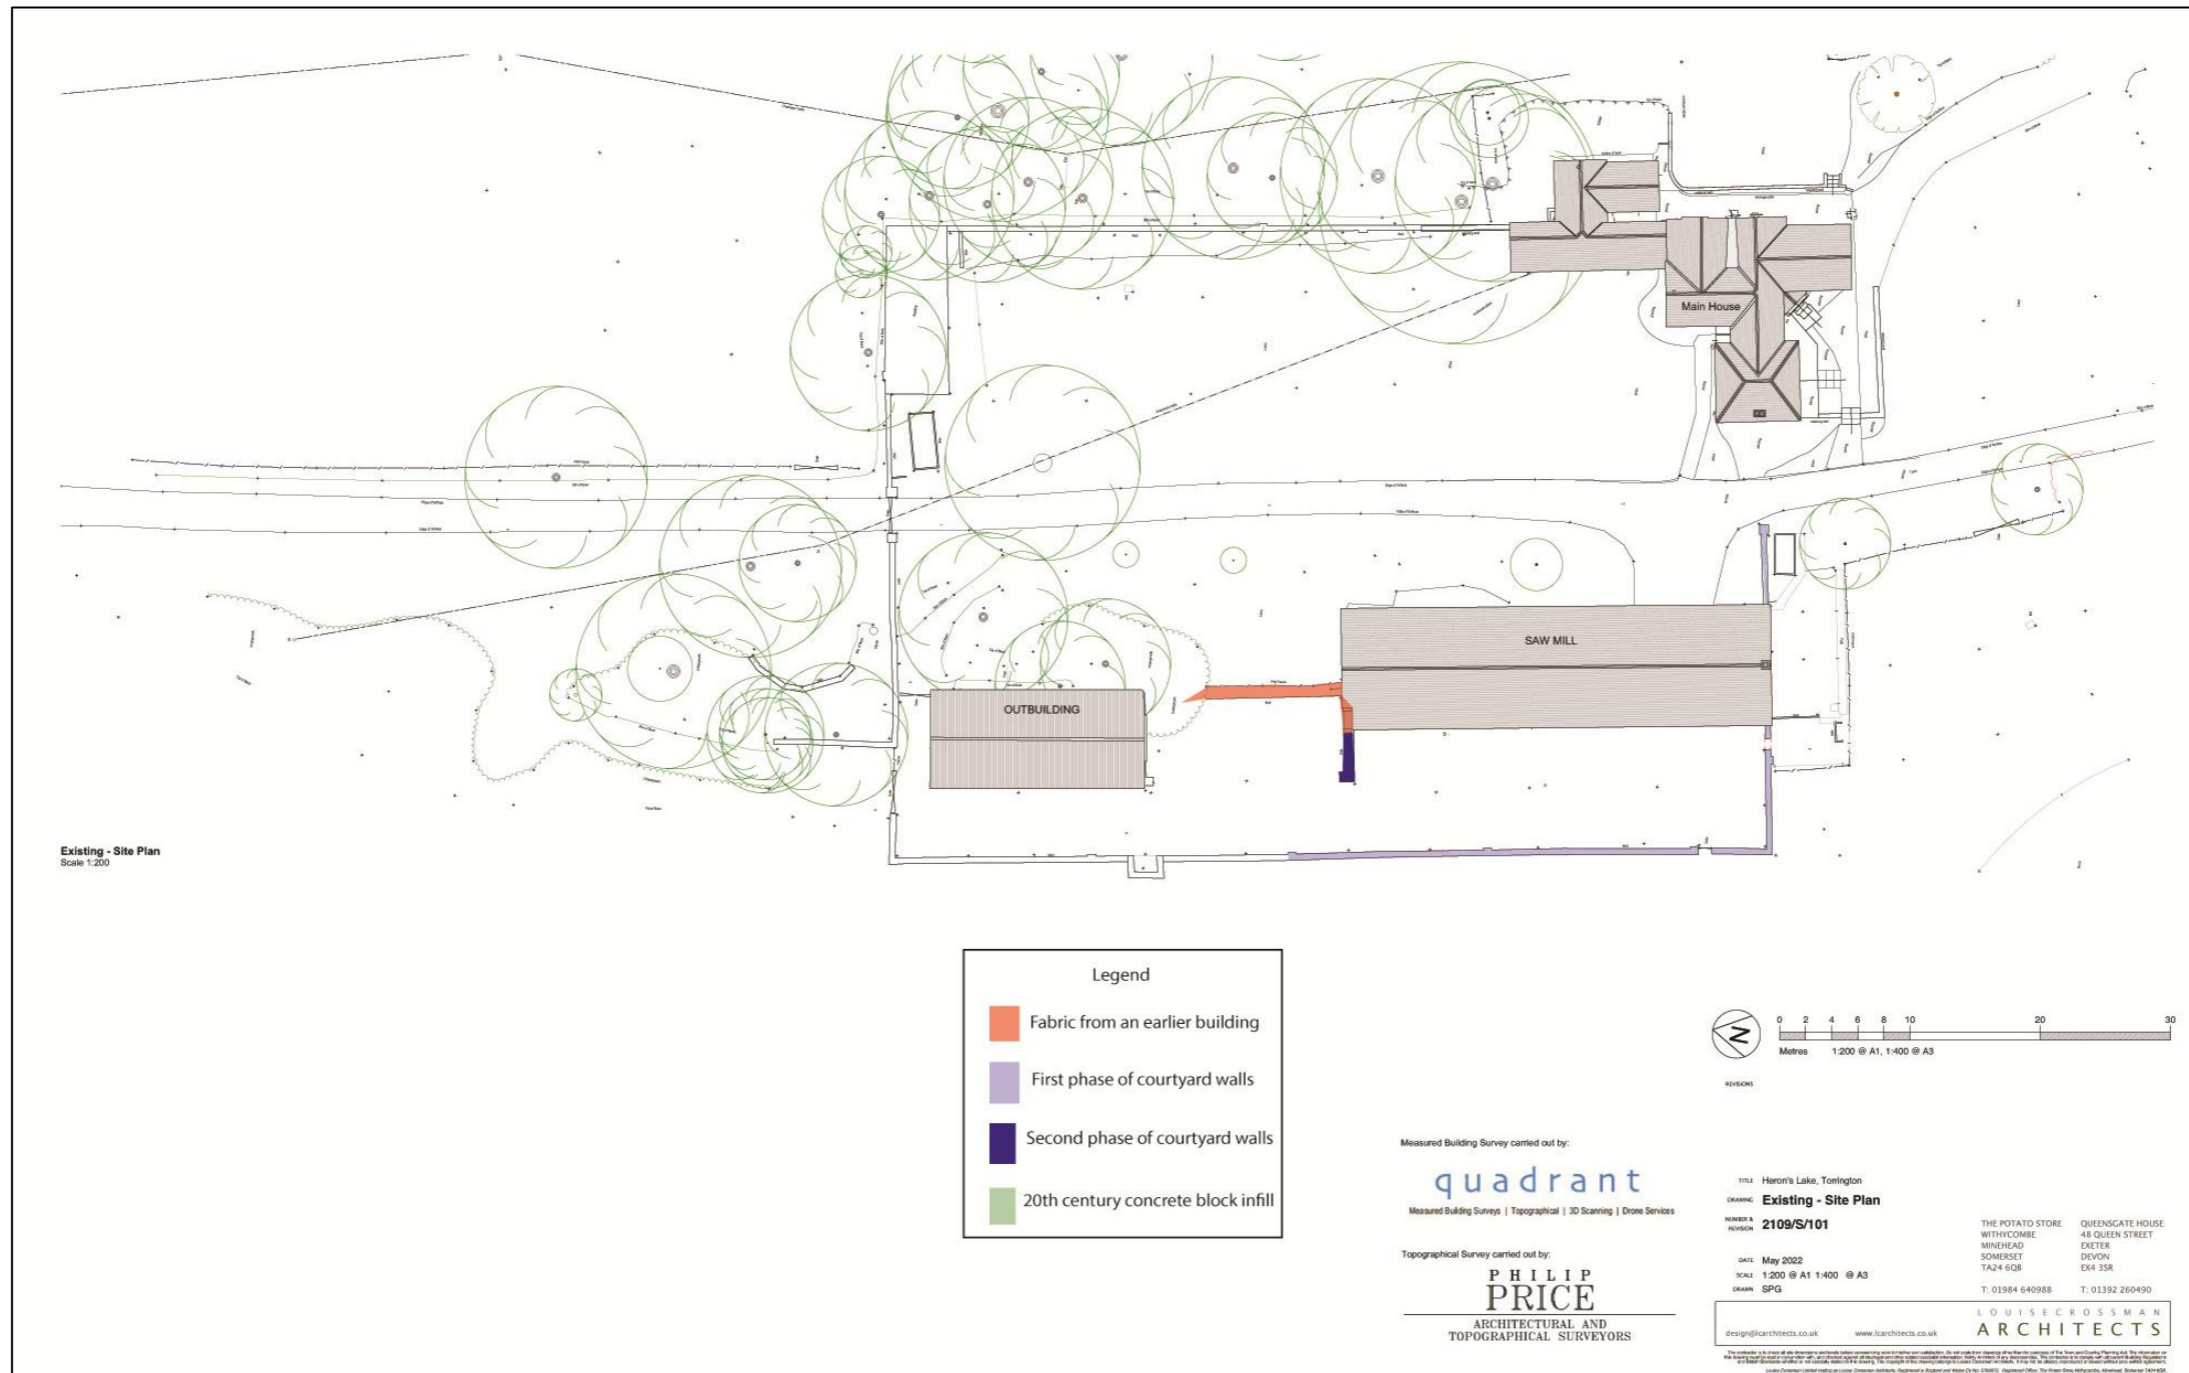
ANNOTATED SITE PLAN, SHOWING ADJACENT WALLS AND COURTYARD WALLS.
